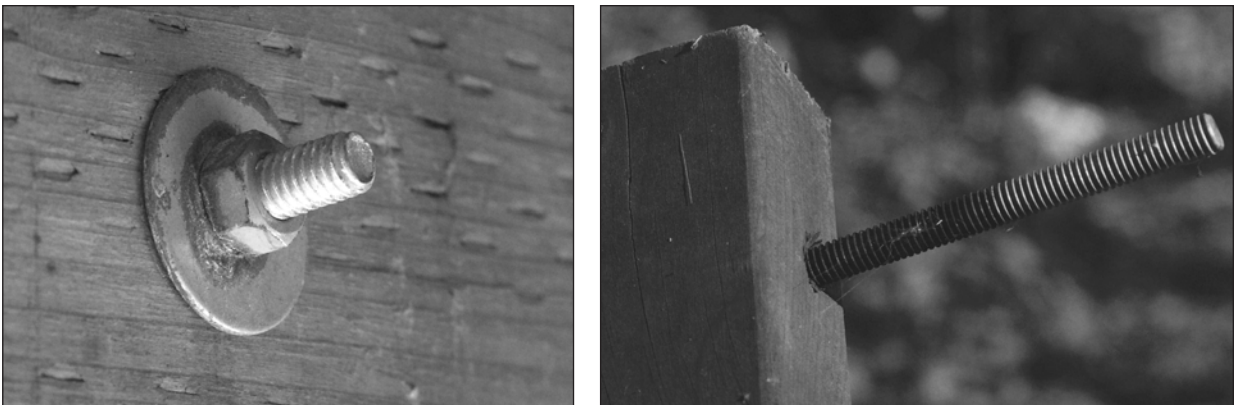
The corrosion on these galvanized bolts was mostly hidden in the joint. Corrosion of the fastener is probably due to galvanic reaction between the fastener, the moisture in the wood, and the copper in the treated wood. Stainless steel would be a better choice here.
